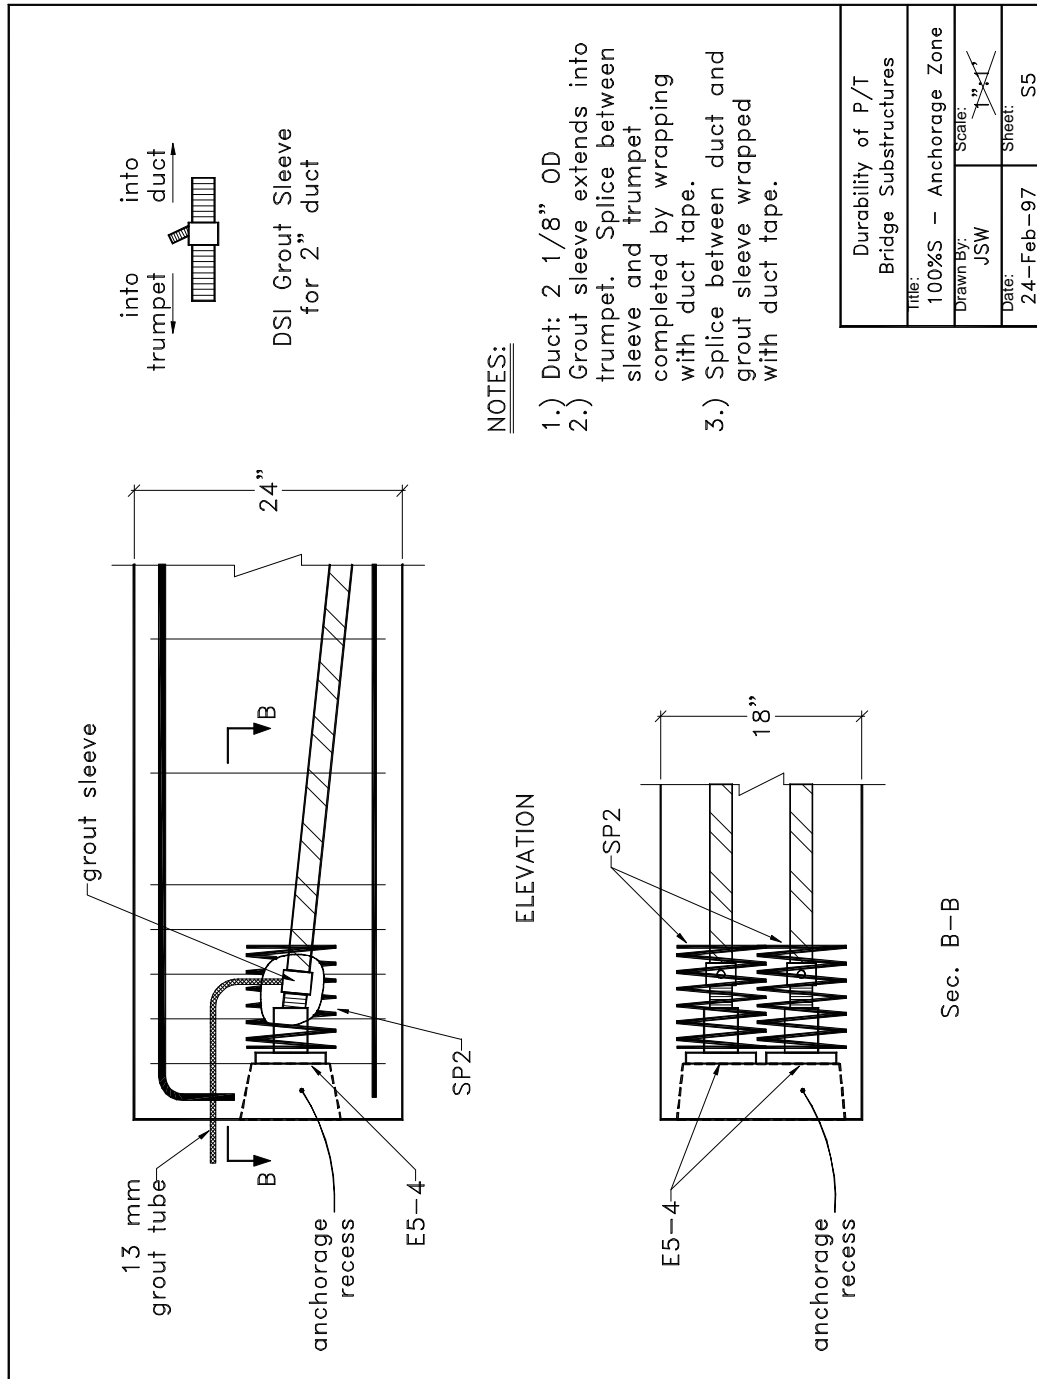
Sheet S5: 100%S Anchorage Zone
